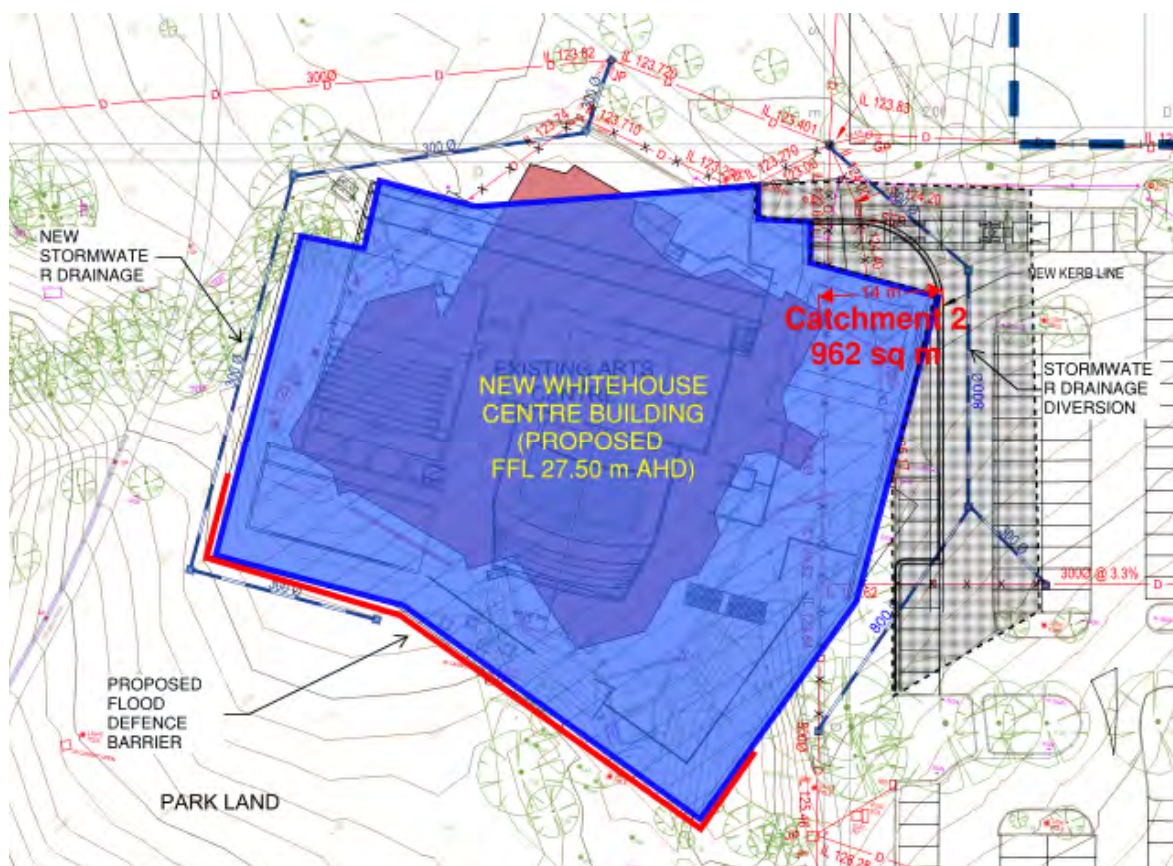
Proposed Flood Barrier to Defend Minor Flood Flows to South Side of Building
